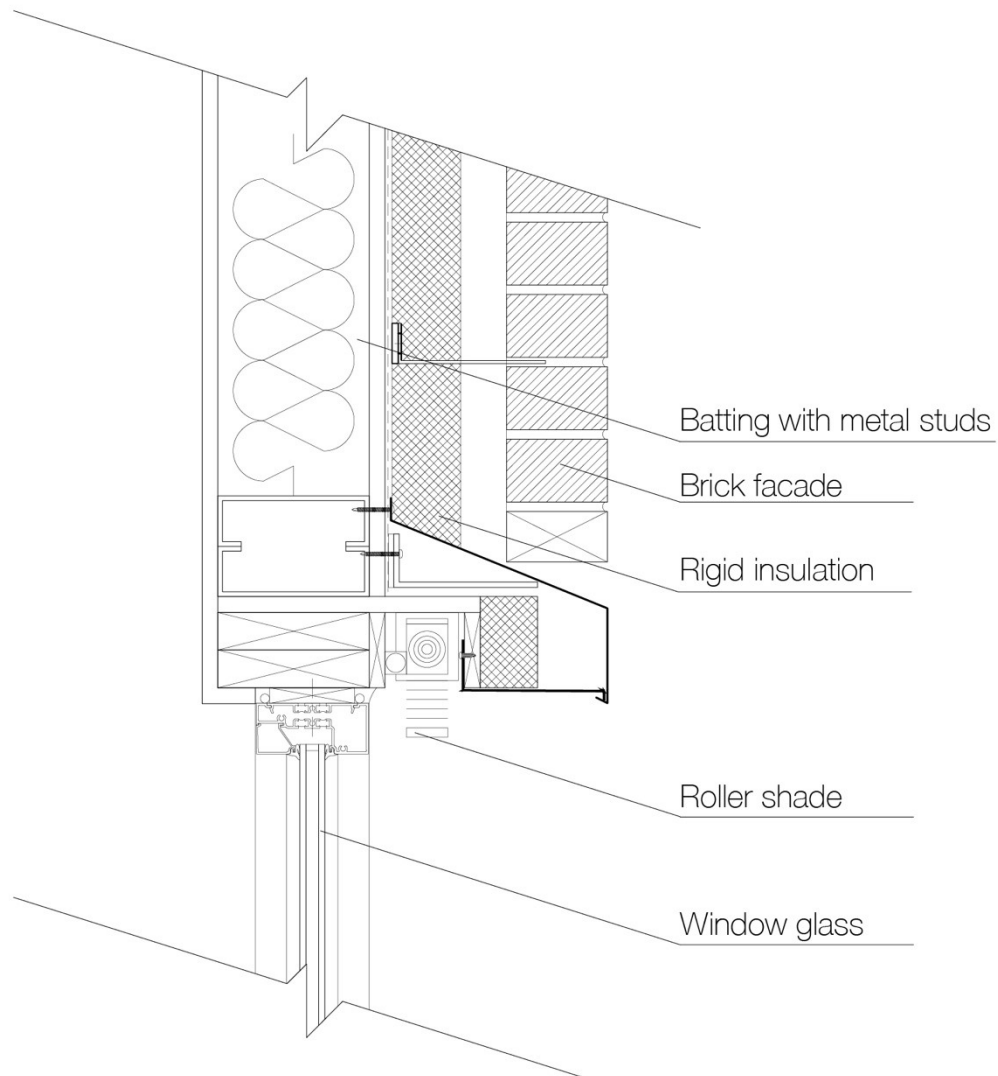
Section through window head, showing insulation, exterior rolling shades, and brick facade.
